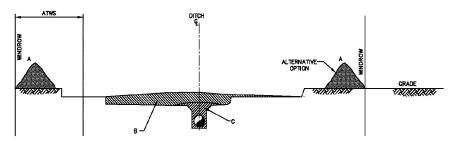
TOPSOIL CONSERVATION DITCH & SPOIL STRIPPING TRIPLE DITCH
